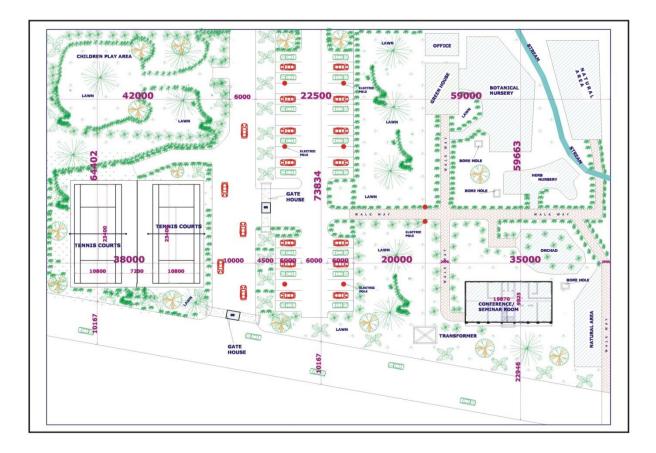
Prototype Botanical Garden Structure Site Layout Plans
